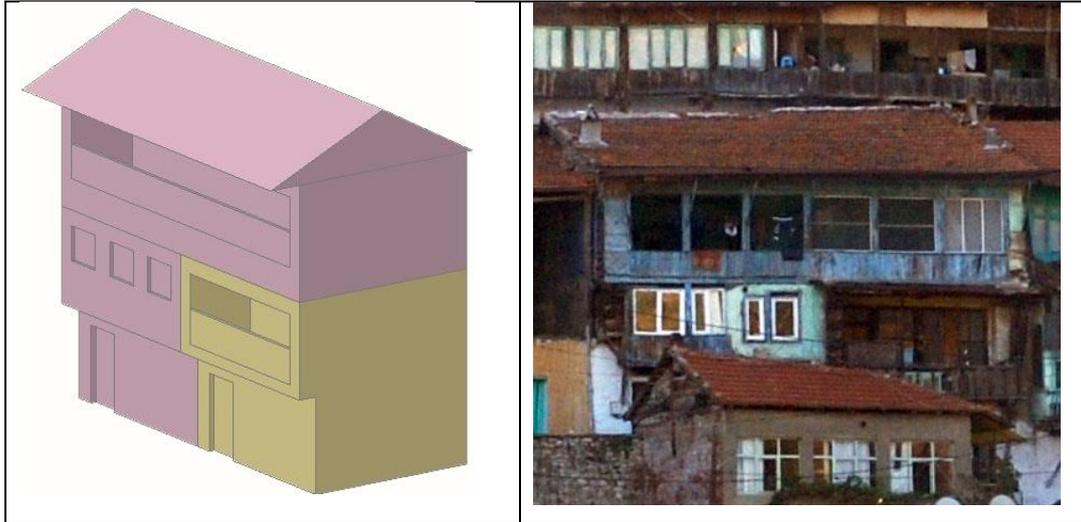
Schematic 3D drawing and photo of the houses numbered 97 and 98
